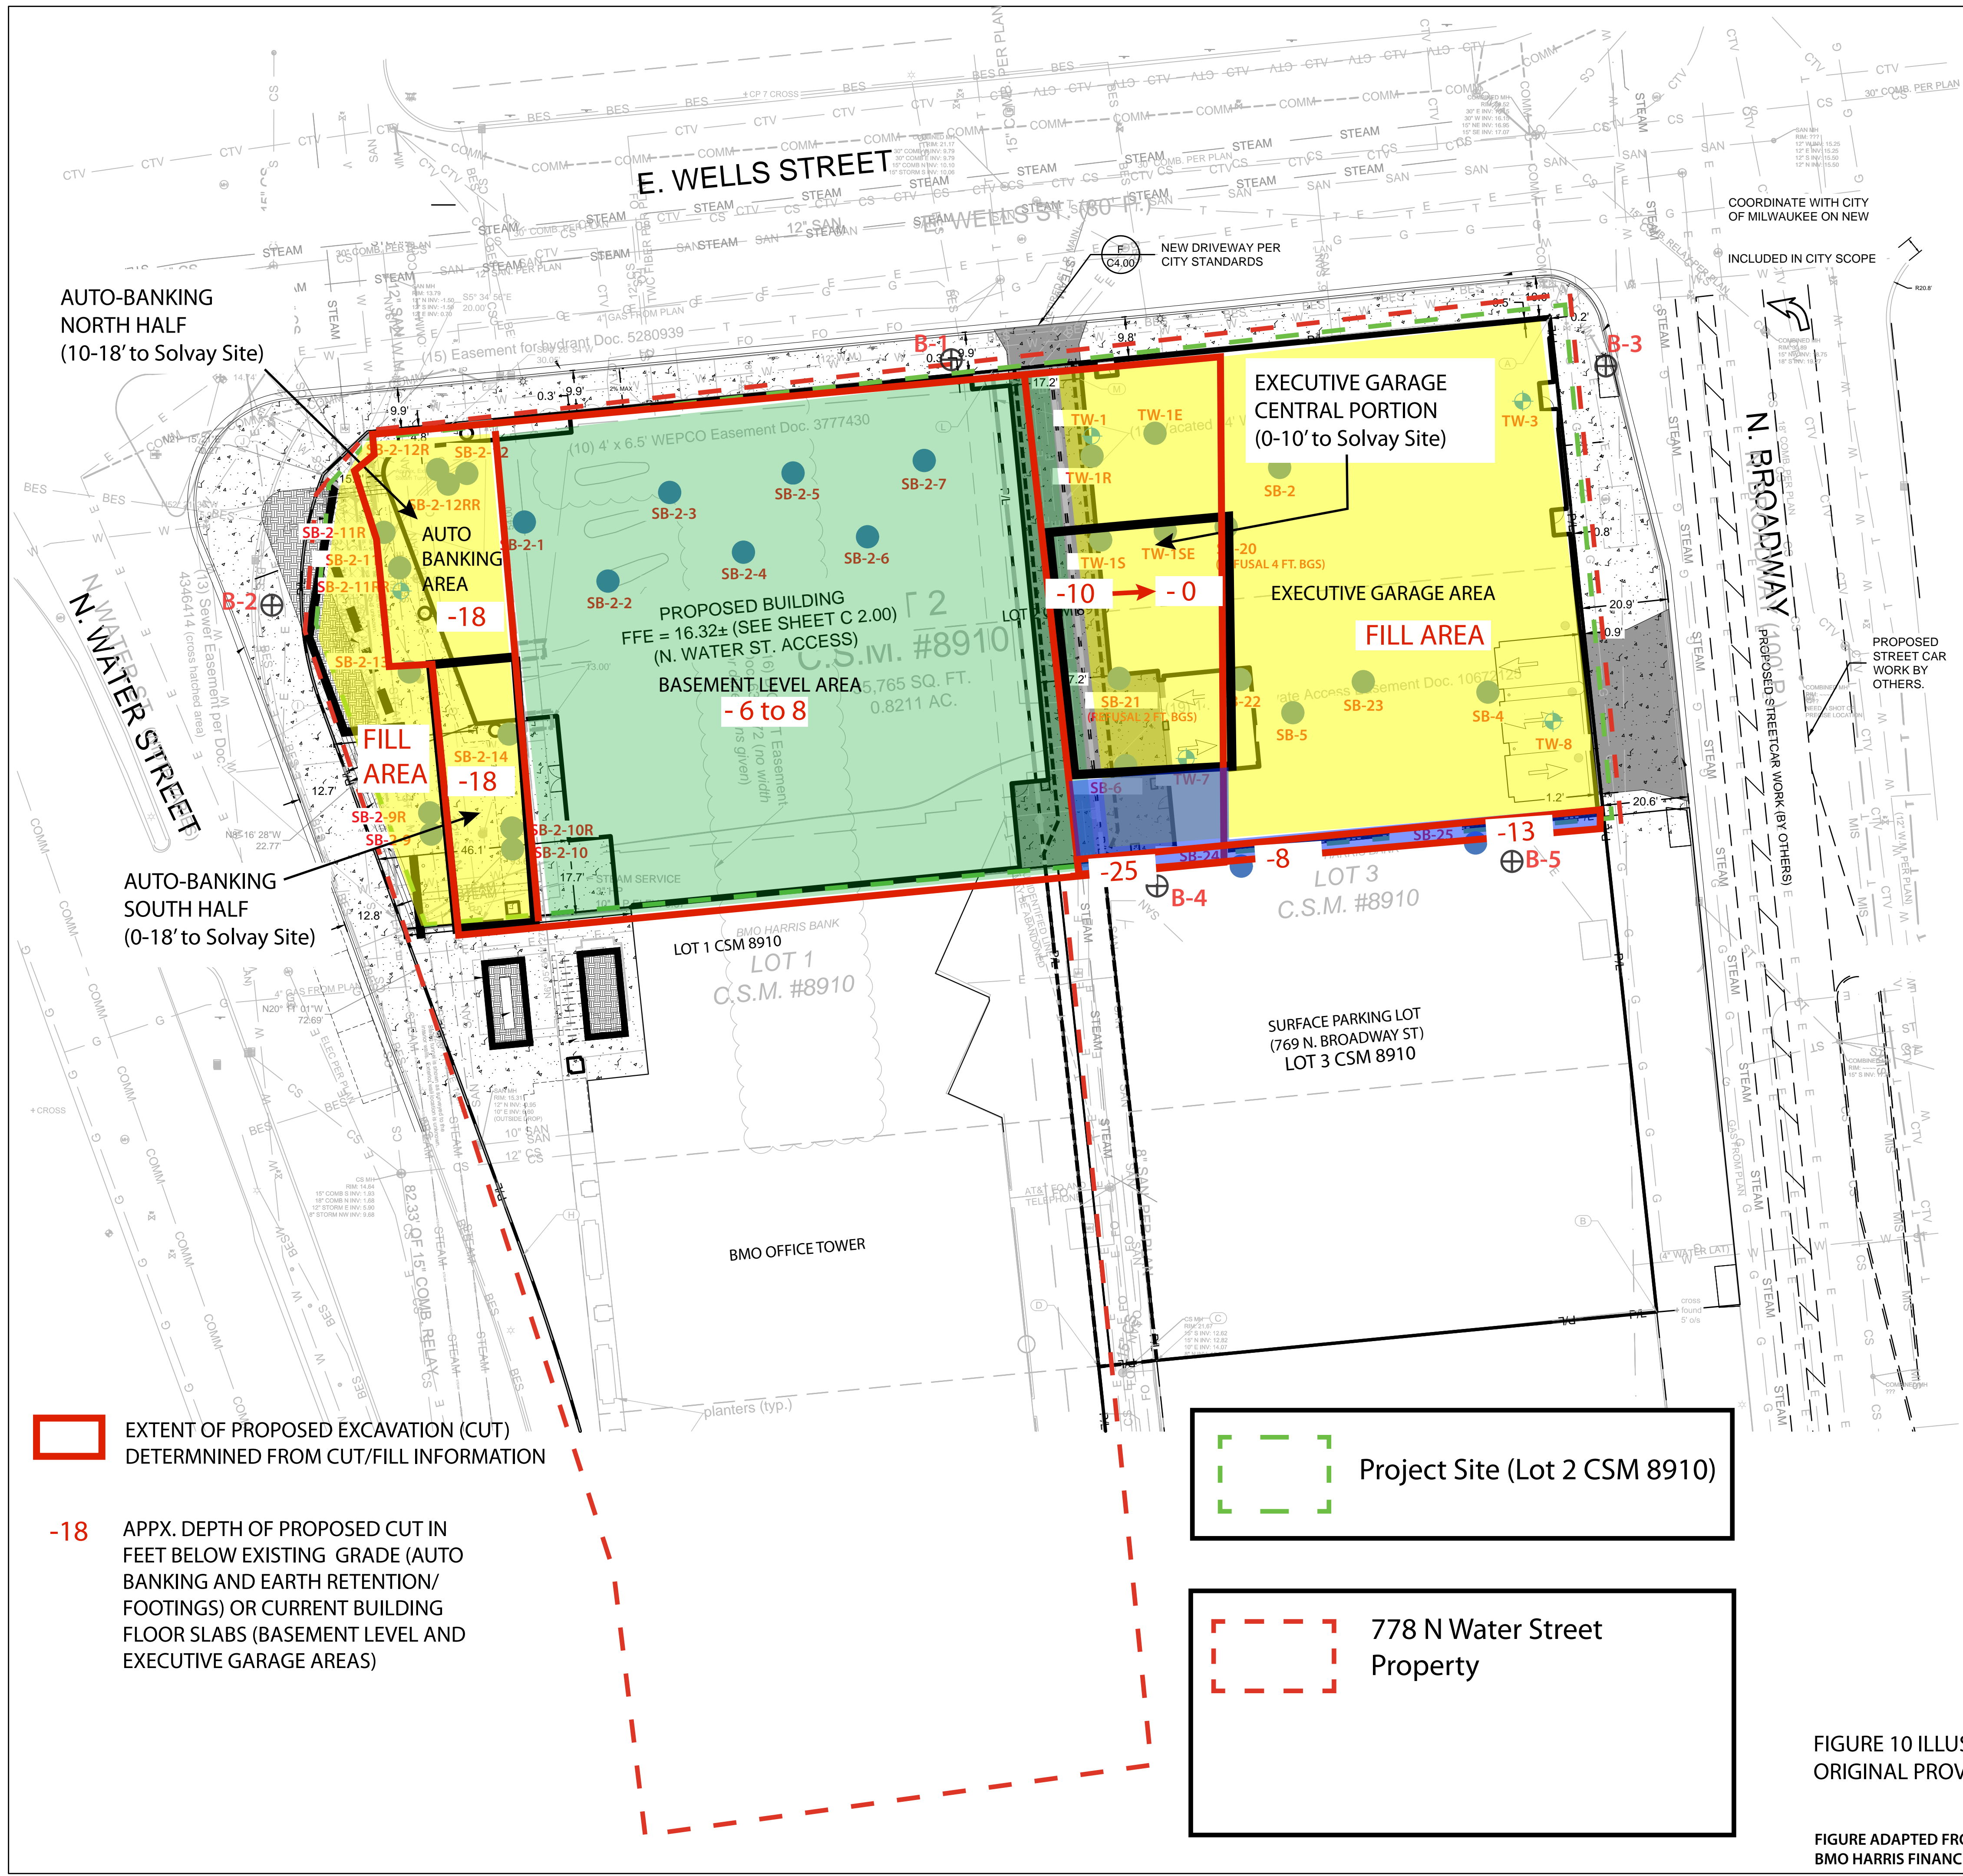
ILLUSTRATES REVISED SOIL MANAGEMENT PLAN FROM ORIGINAL PROVIDED IN SIGMA SI/RAP & SI/RAP ADDENDUM
